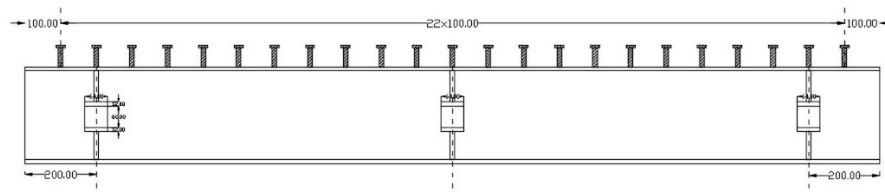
Elevation view of the beam connections of the girder with vertical steel webs (mm).
